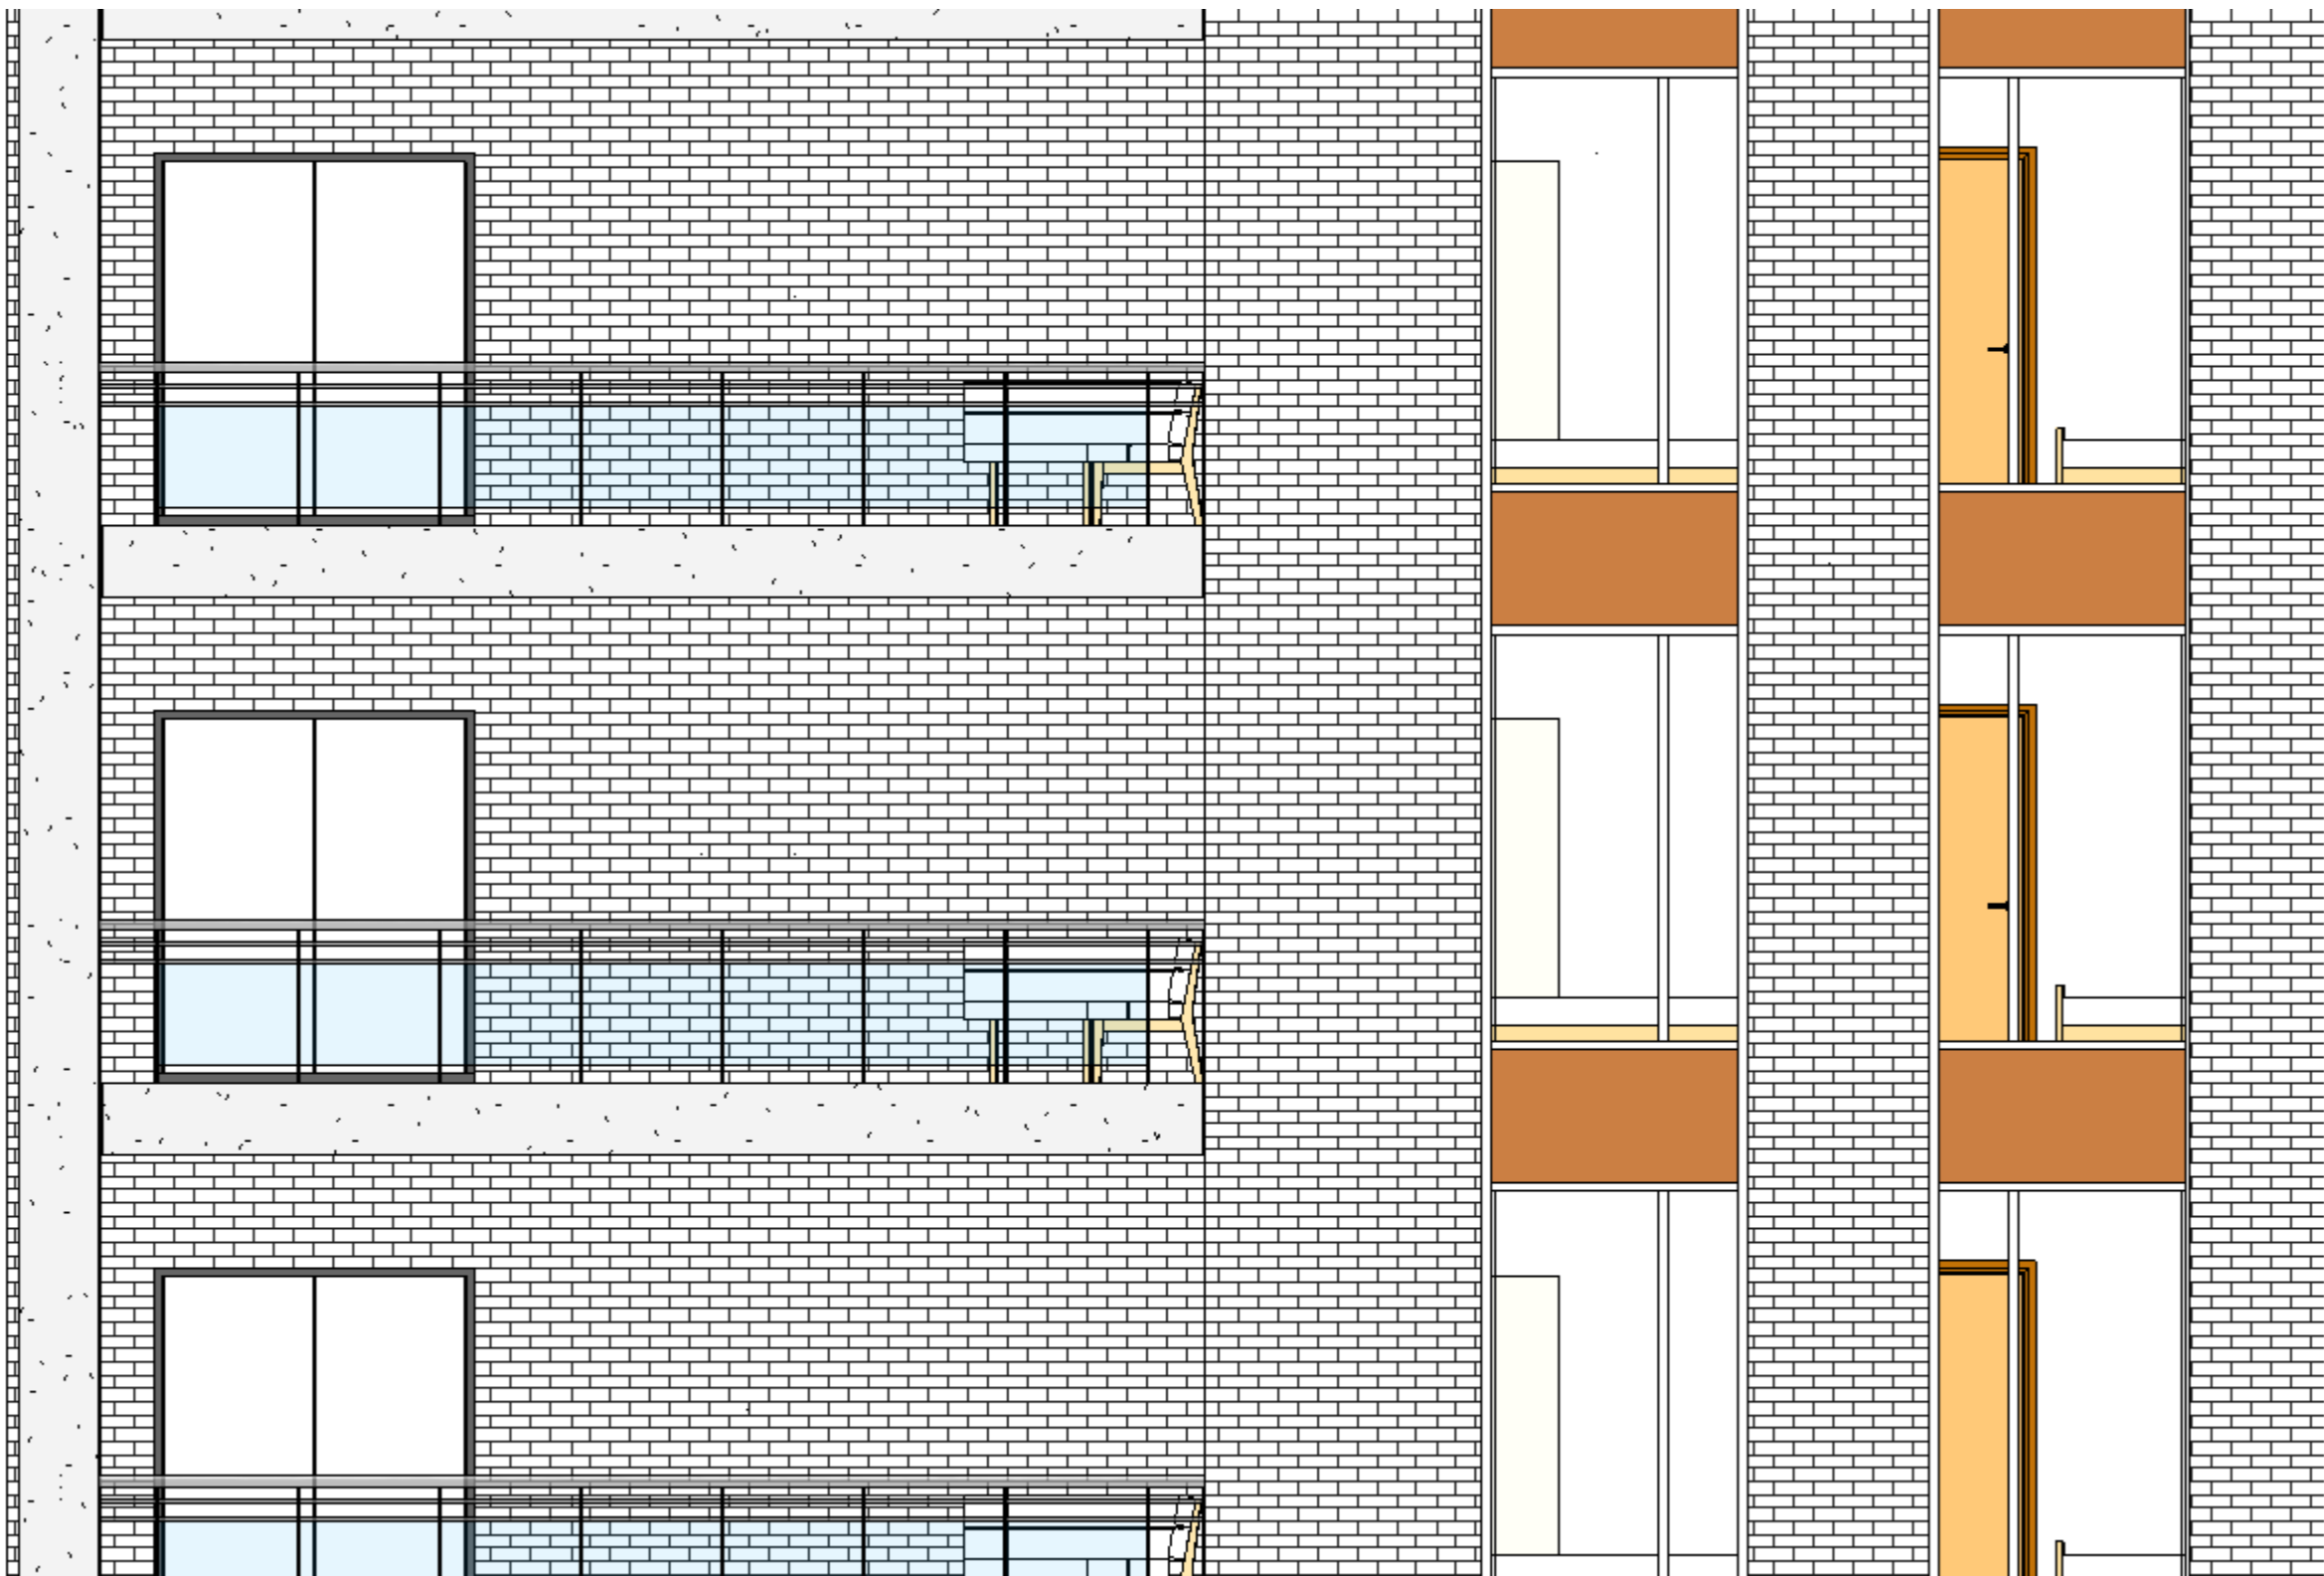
Enlarged Terrace Elevation (Author, 2021)
